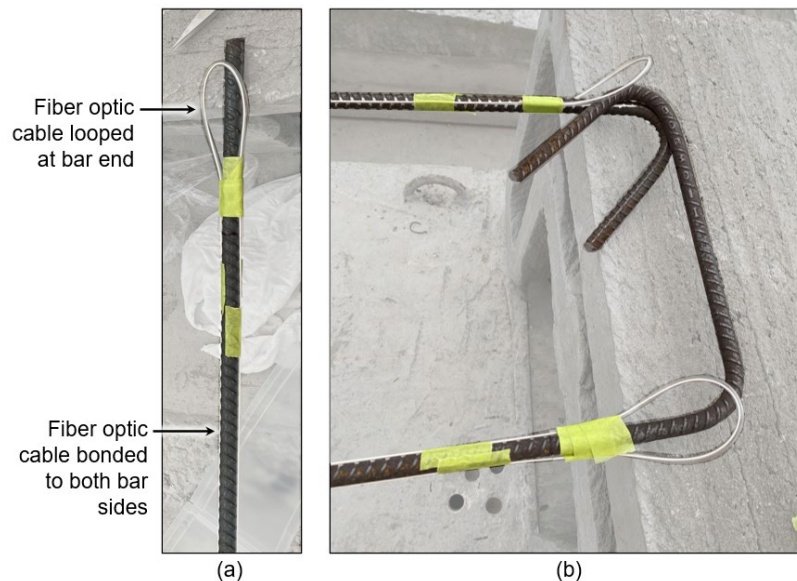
Typical installation of optic fibers on: (a) the longitudinal steel reinforcement and (b) the horizontal steel reinforcement.
